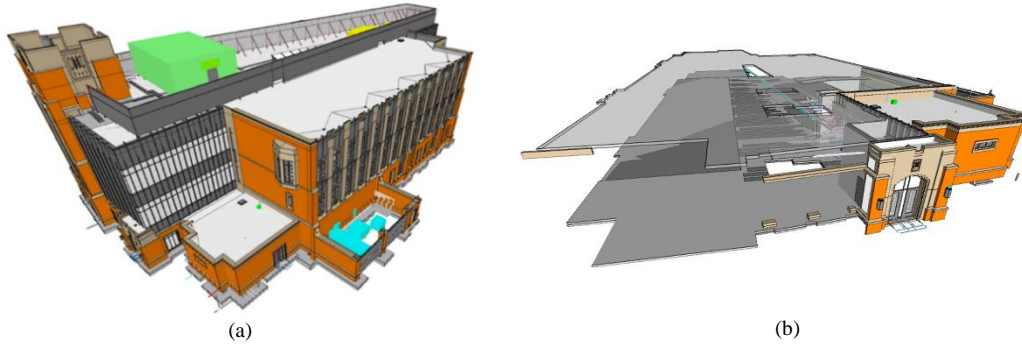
Navisworks As-Built Building Model (a) and First Floor Mechanical Room (b)
